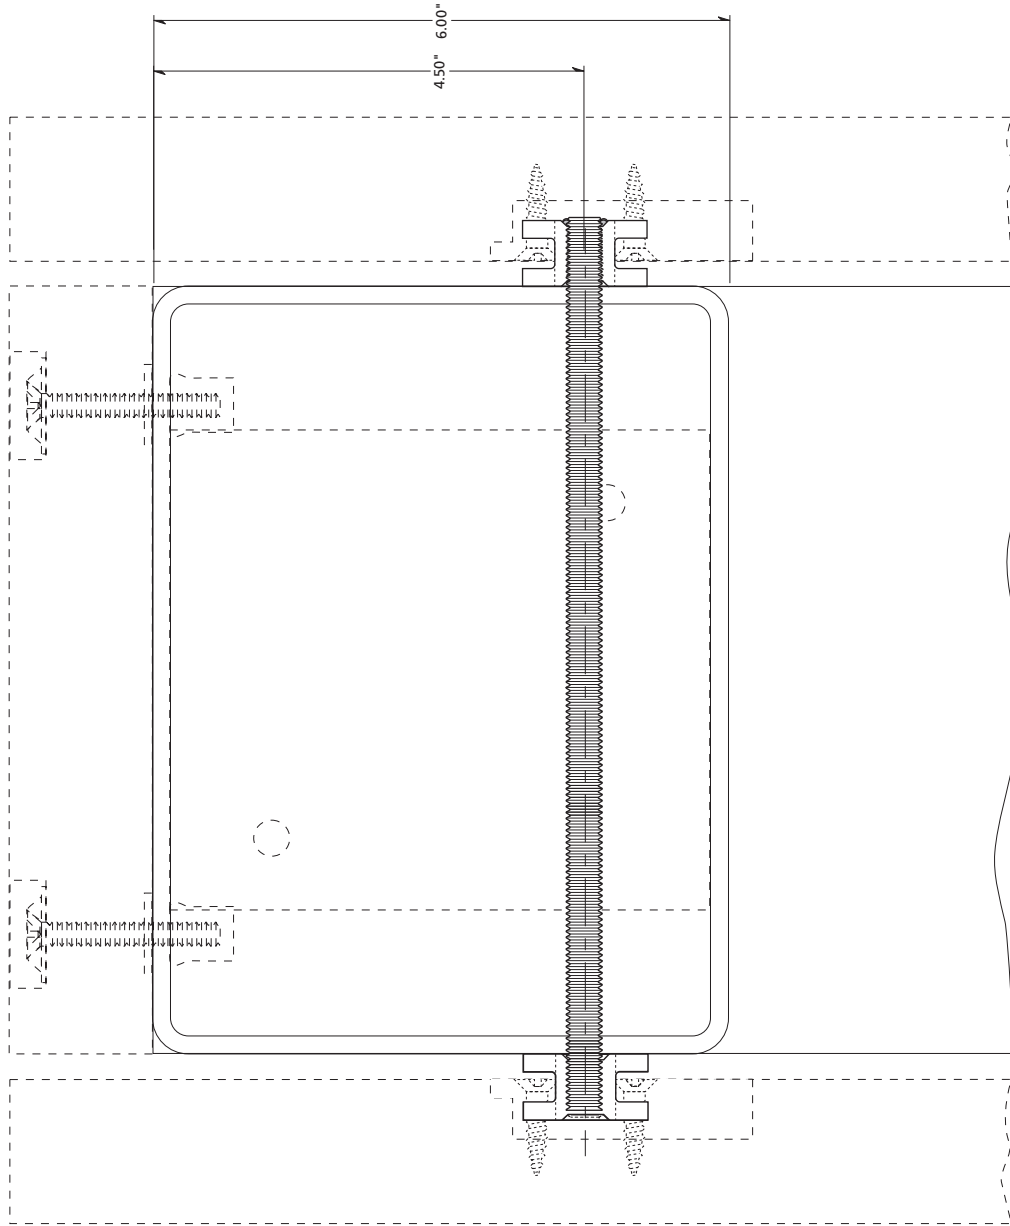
" x 6" STEEL RAIL PLUG SCHEMATIC ASSEMBLY
